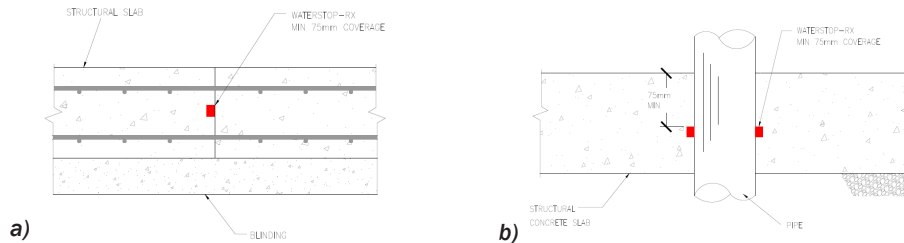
Installation transitions in: a) monolithic elements and b) pipe cover
